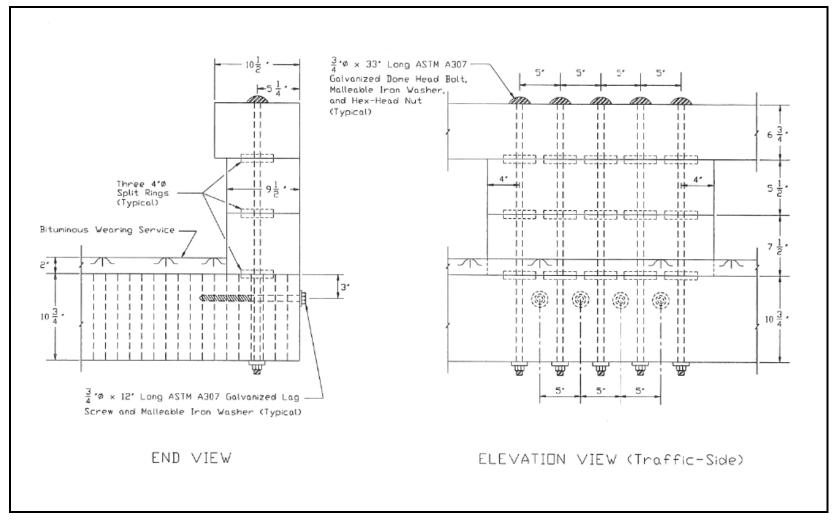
Cross Section of Curb-Type Glulam Bridge Rail
